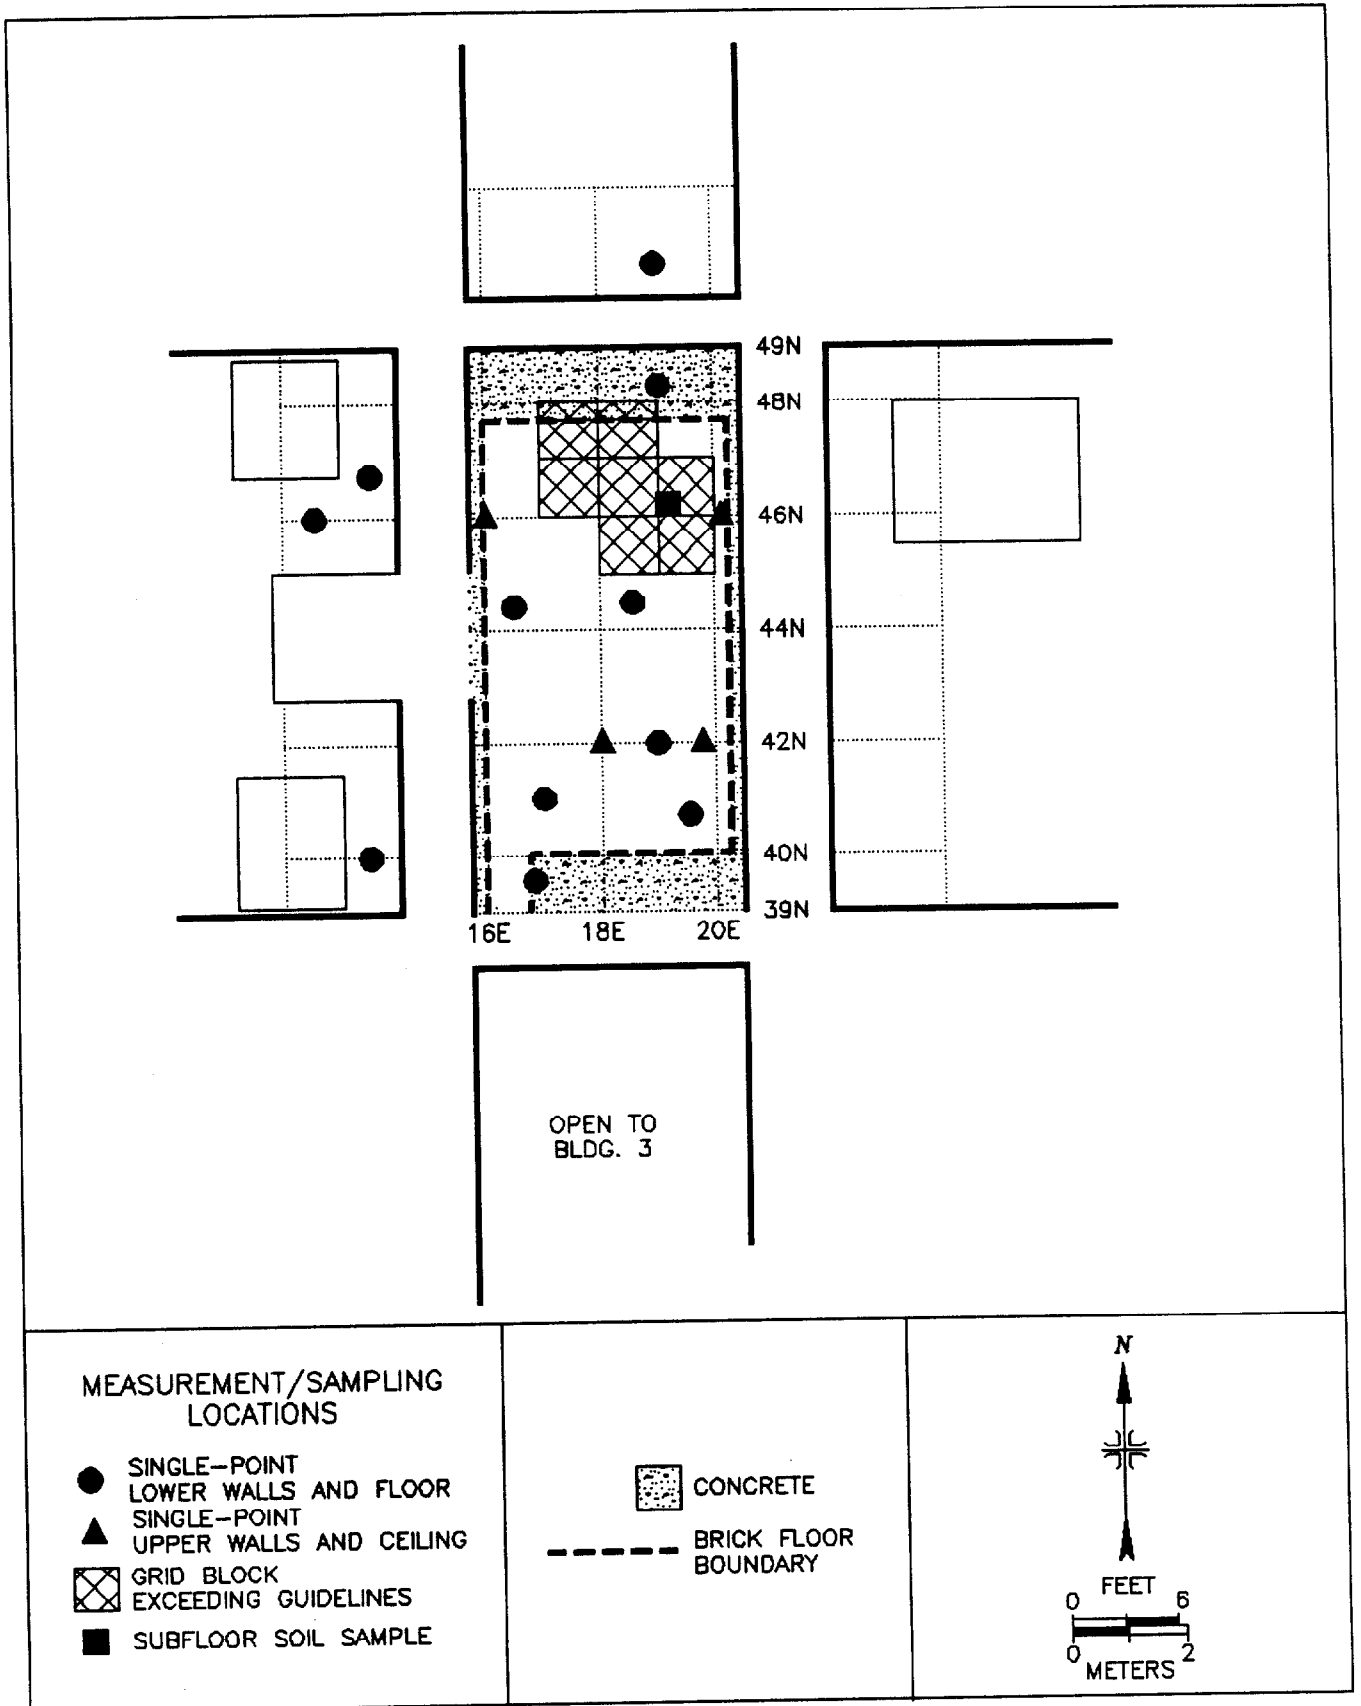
Building 8, Room B - Measurement and Sampling Locations
